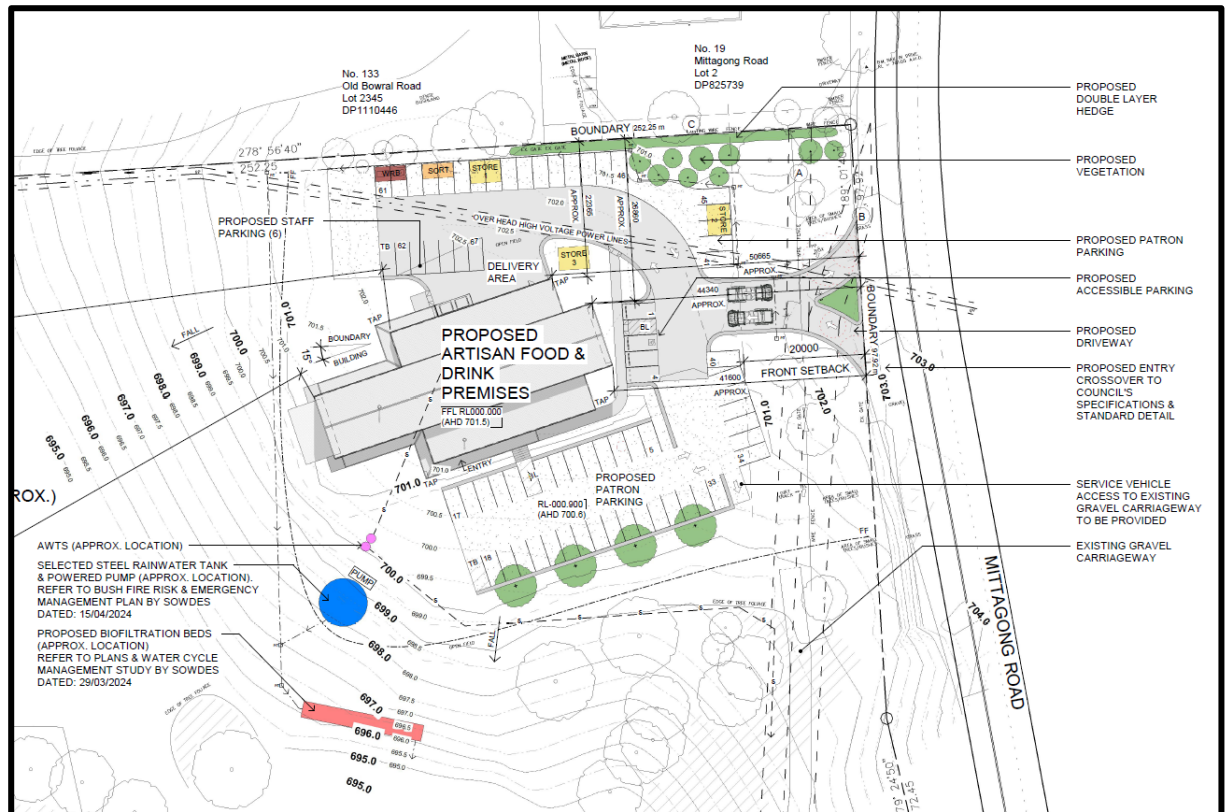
Detailed Site Plan Extract (Source: Studio Design)
